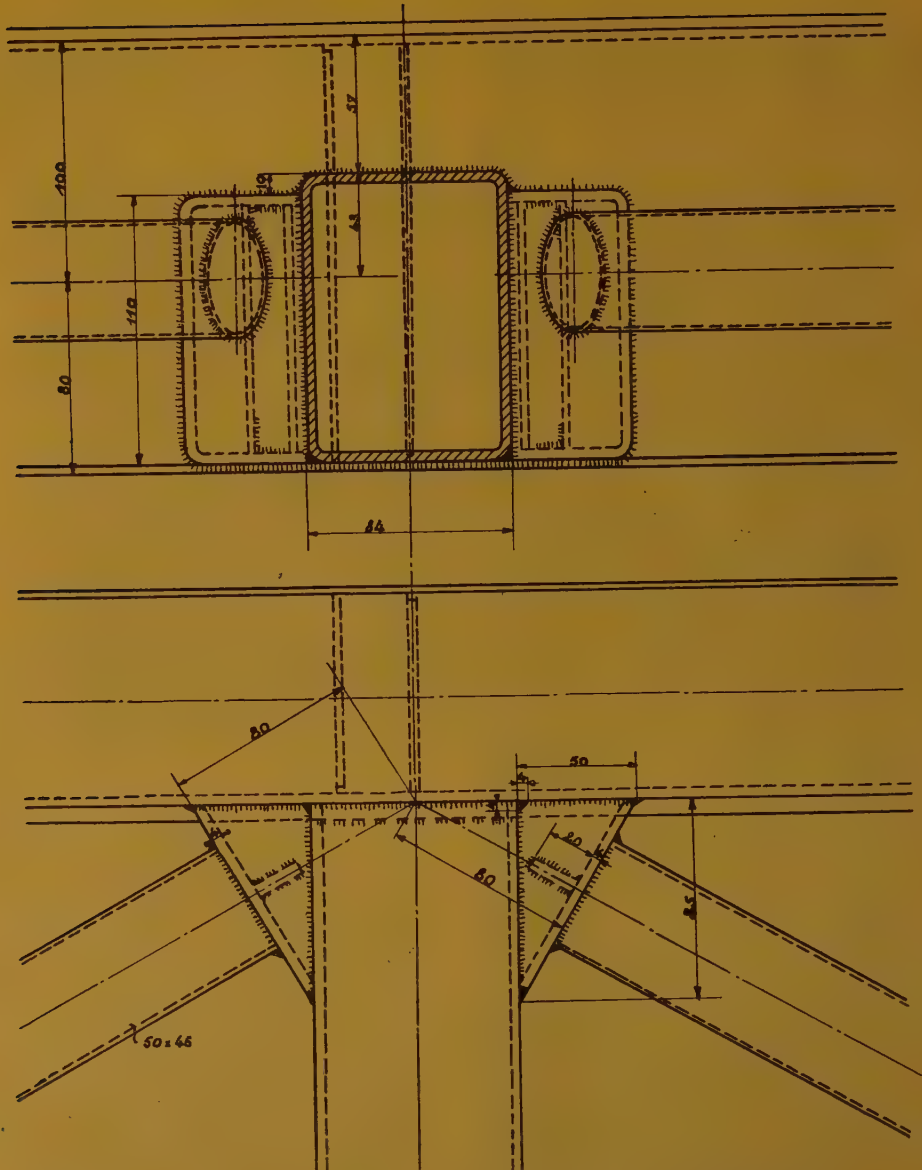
Dutch triplet — Example of assembly (welded tubes).
